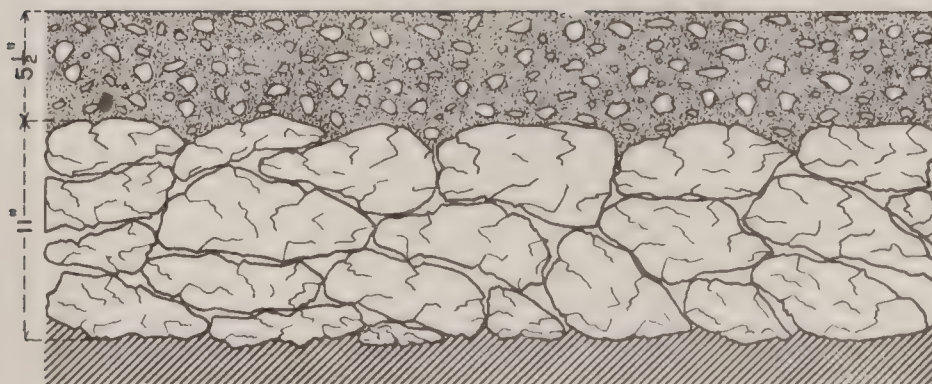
GRAVEL ROAD, CENTRAL PARK, NEW YORK.
